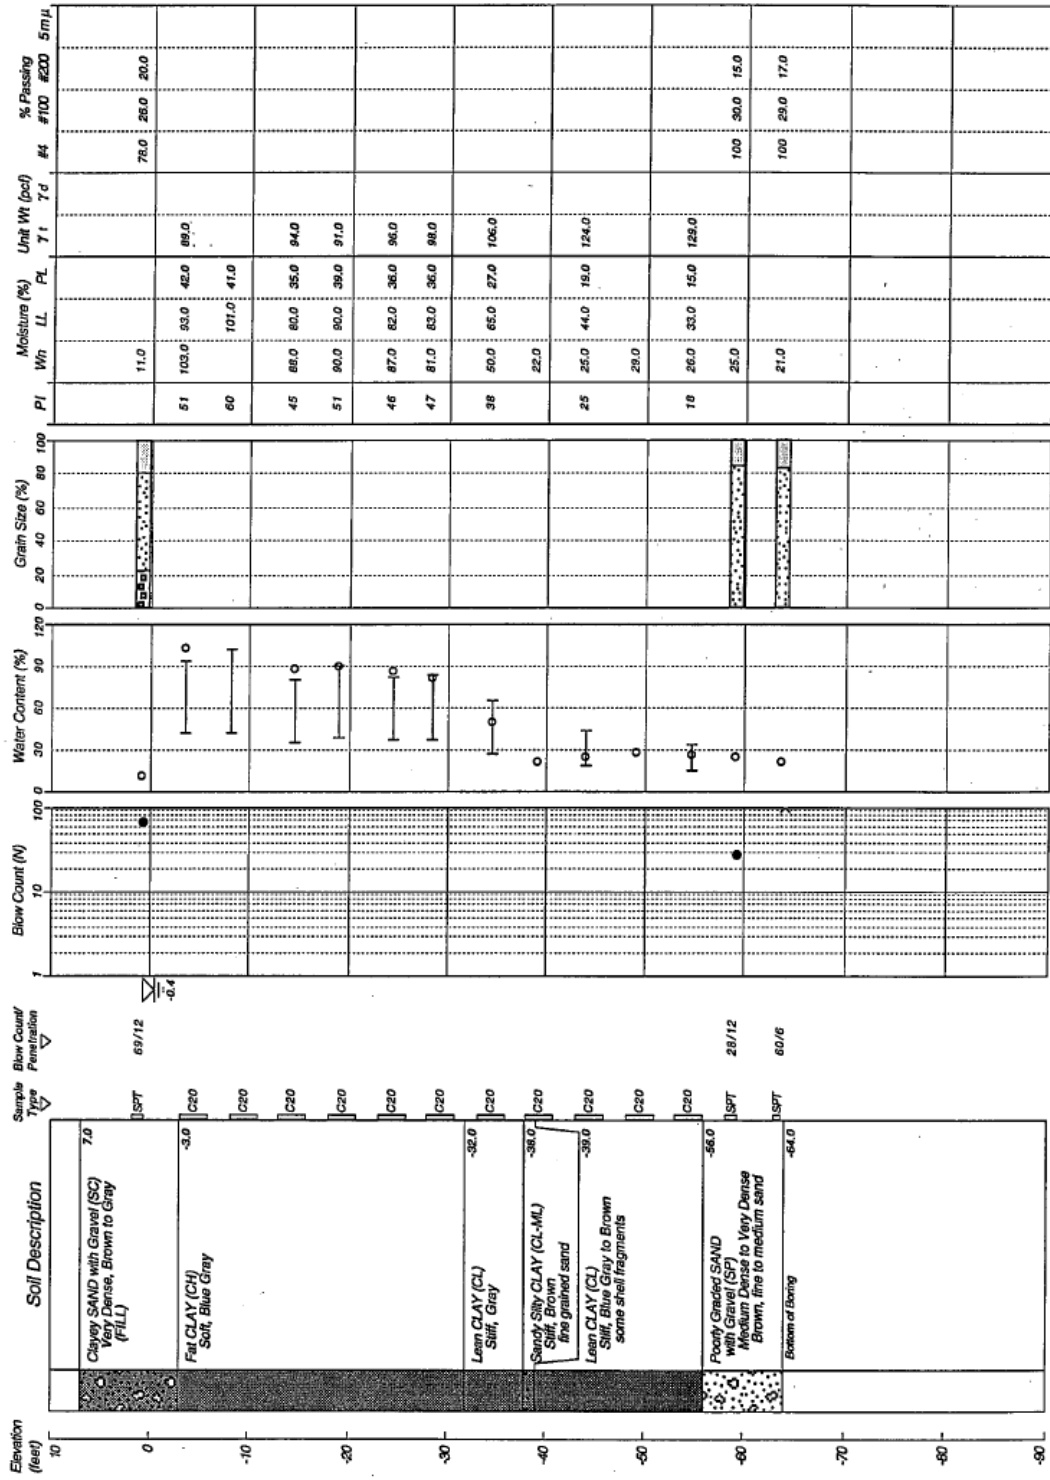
Boring B-15, Site 4 (Lemke, 1997)
